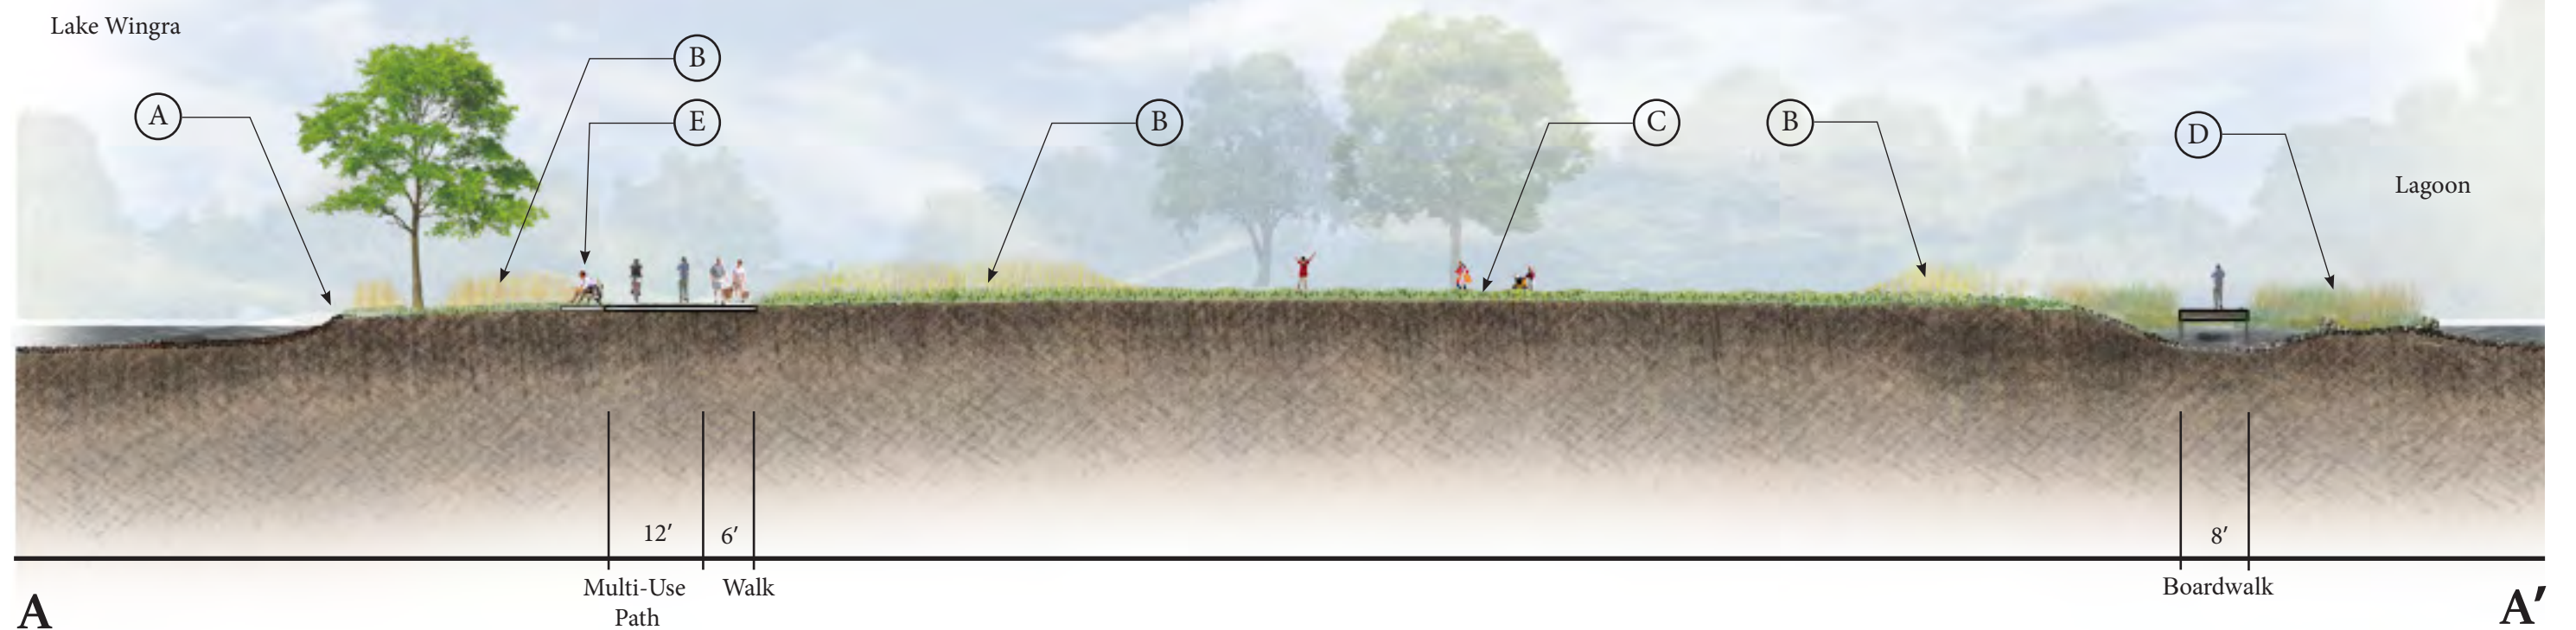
Vilas Park Drive and Peninsula Cross Section
